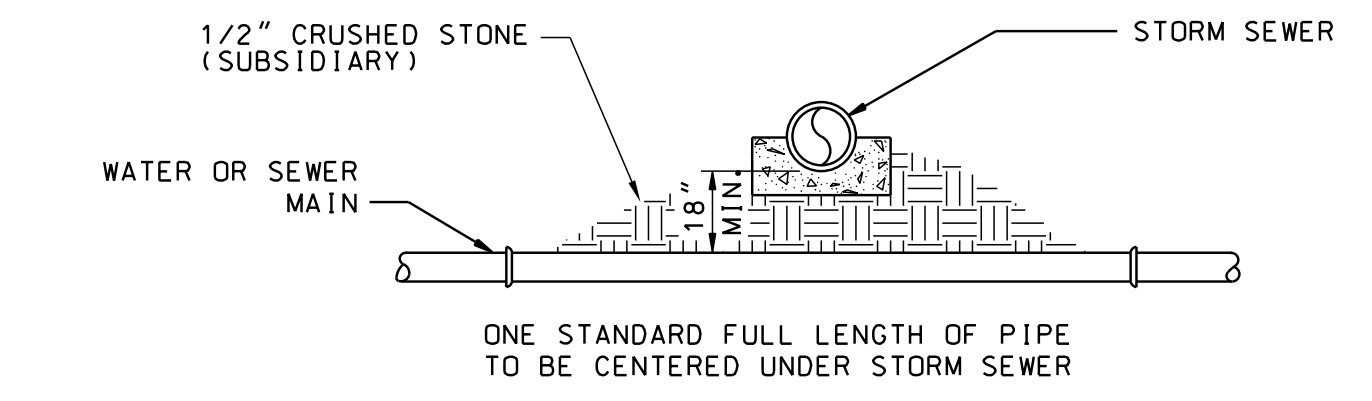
WATER/SEWER MAIN LESS THAN 18" ABOVE STORM SEWER
